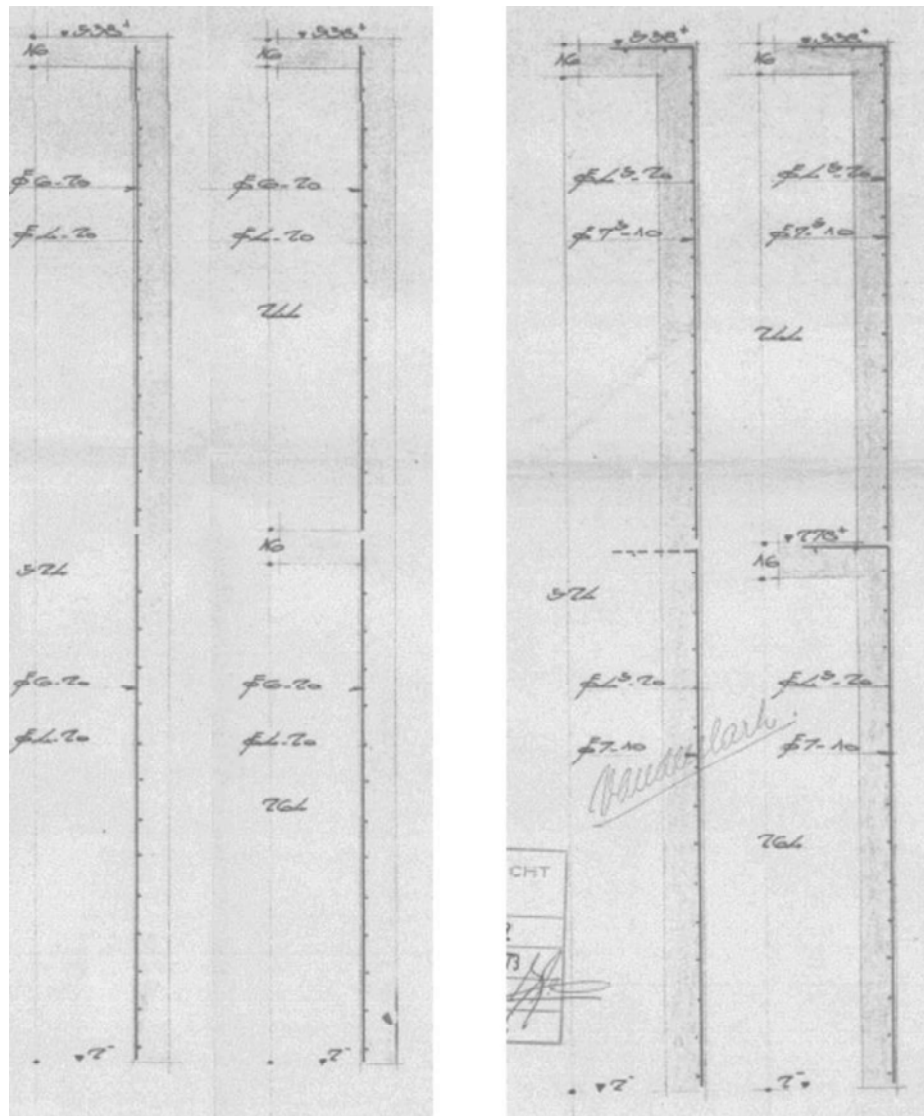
Technical drawings of the reinforcement of the external walls for a building belonging to BETON1a typology; adapted from [Arup, 2016b].
